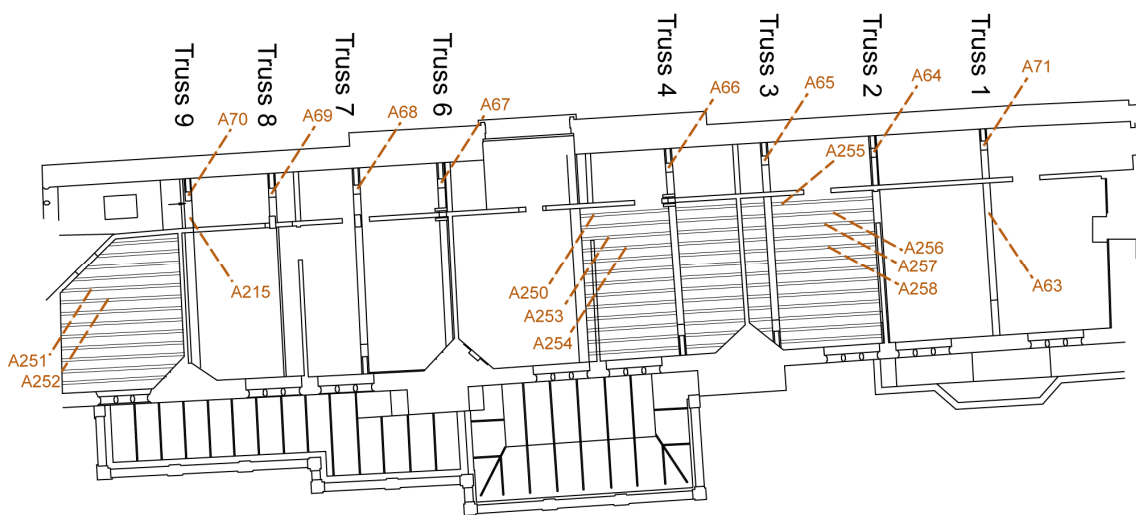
Attic plan of the South range, showing the locations of samples APT-A63–71, A215, A250–8
